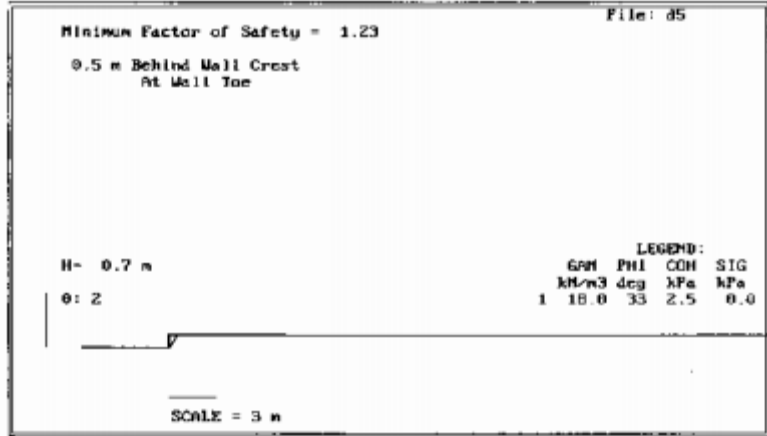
Load Case 1: First Excavation Lift – No Nails – No Live Loads.
